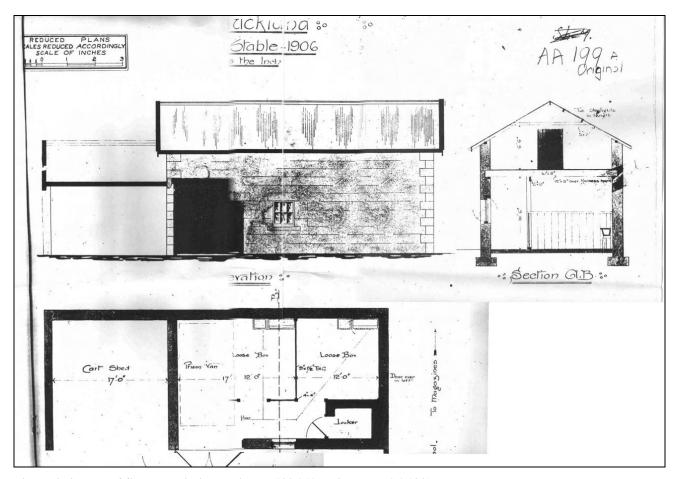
Plan of Stables building dating to 1906 (Archives NZ, AA199)
